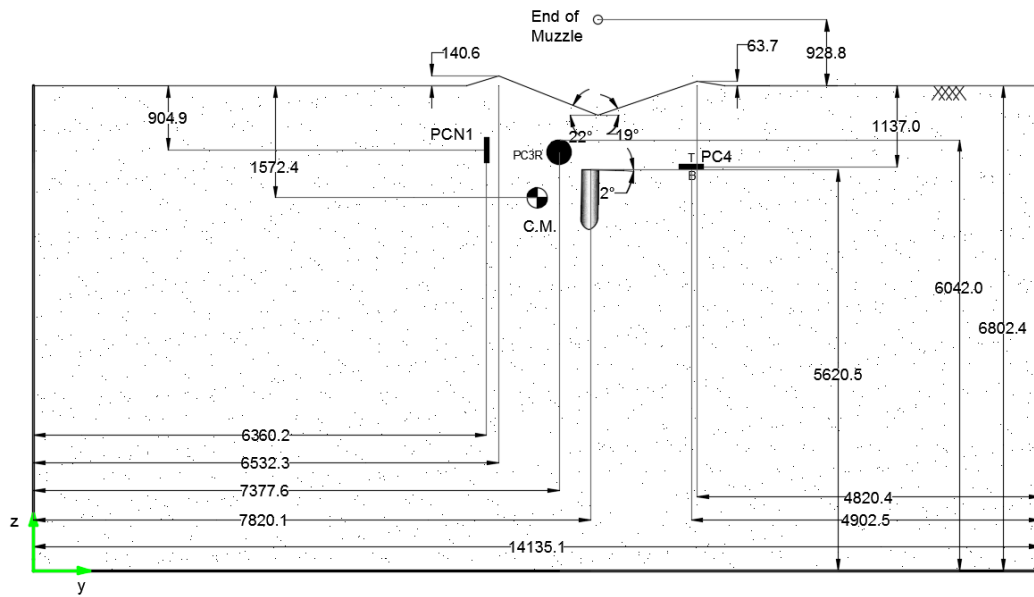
Schematic sketches of the penetrated projectile in test 1 and the formed crater: plan view (dimensions in mm)
